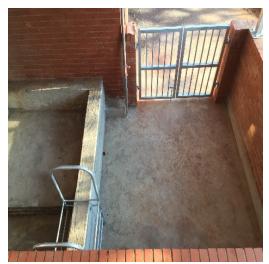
Wall to be broken down outside basement lift (done in July).
